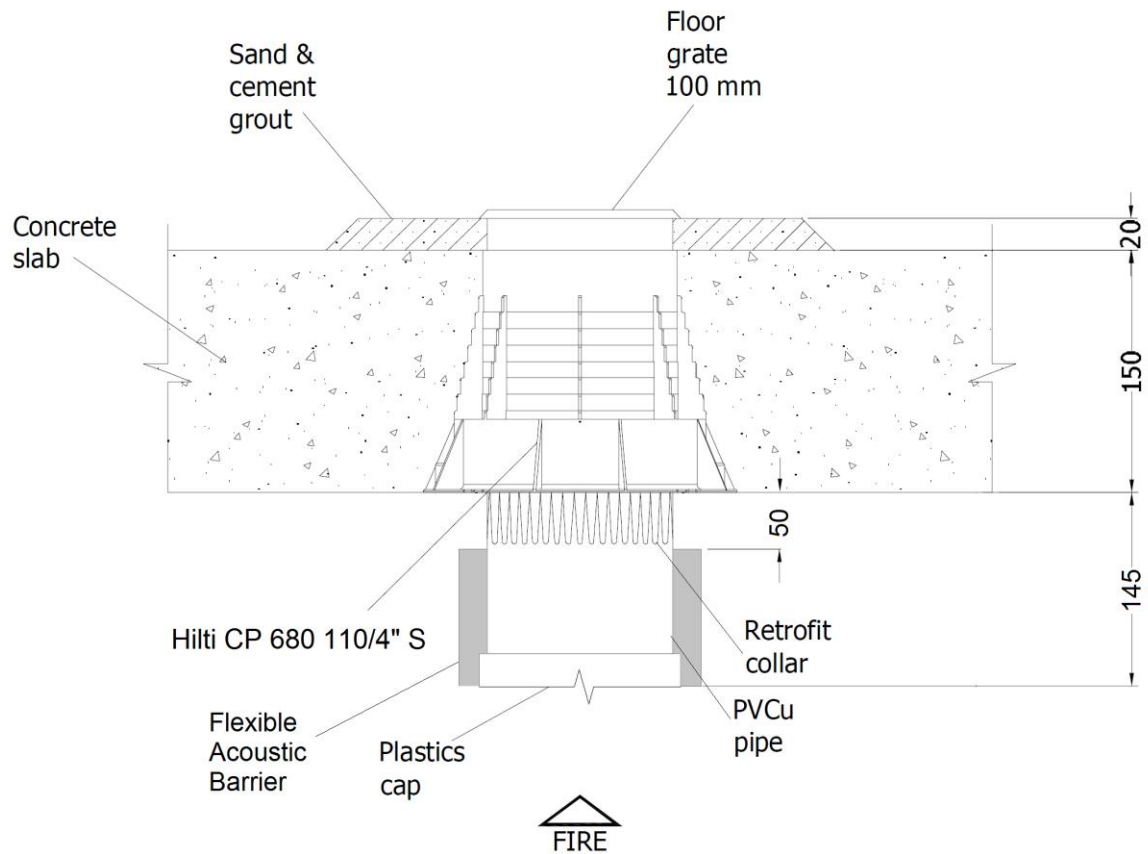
uPVC floor waste – straight pipe protected with CP 680 110/4" S + CP 680 N-RAD Cast-In Firestop Collar System without Ultrafloor, optional flexible acoustic barrier at least 50mm from underside of concrete slab
